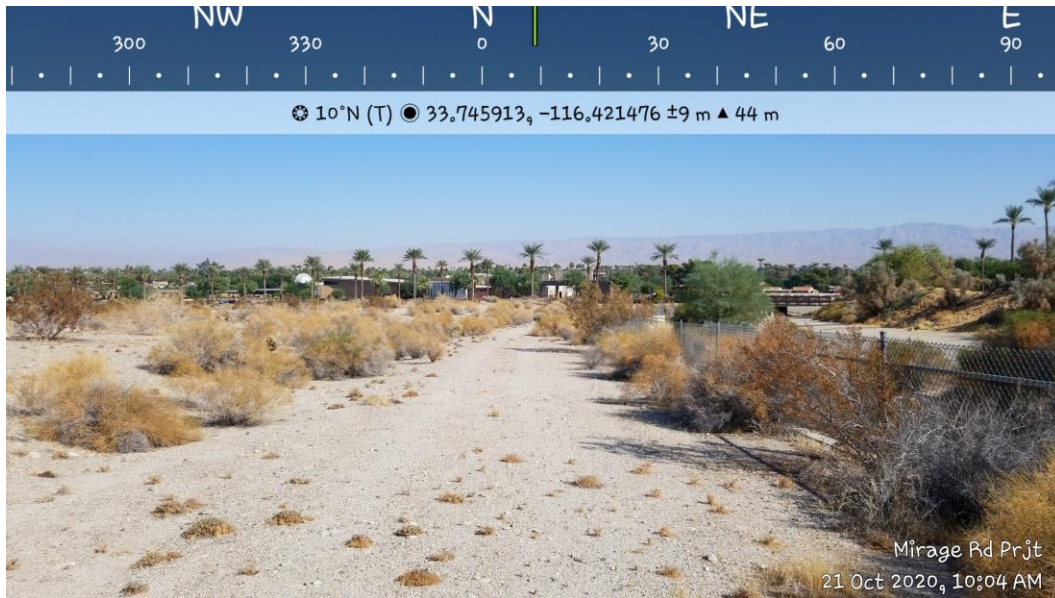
Representative condition of site as seen facing north from the southeast corner of the site. Photo shows the concrete West Magnesia Falls Storm Channel that parallels the east boundary of the site.
